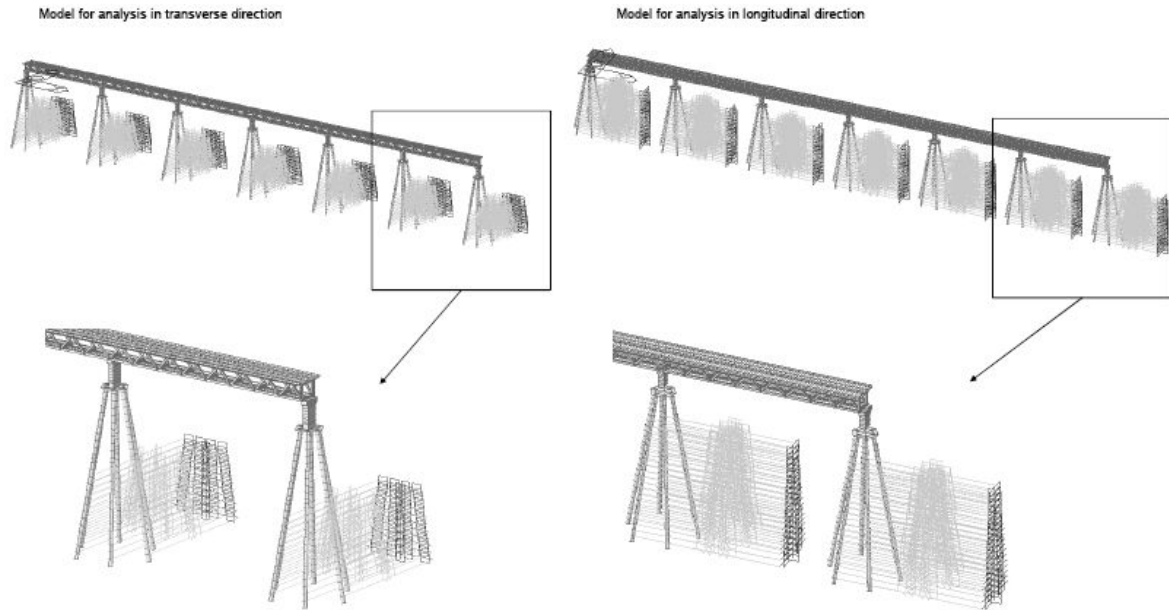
Global Modelling of the Piers including the Deck Structure in a 3D Structural Penzien Model
